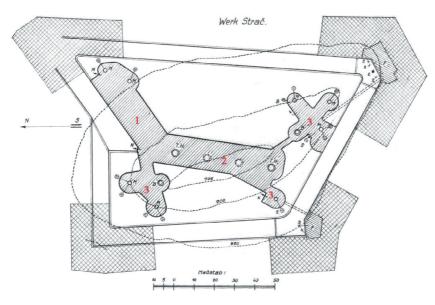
Sketch of the final designs of fort Srač after 1911. 1 – Barracks block. 2 – Howitzer battery. 3 – Machine gun positions for close defence. F – Caponiers. (Source: Pachauer, 2016.)
